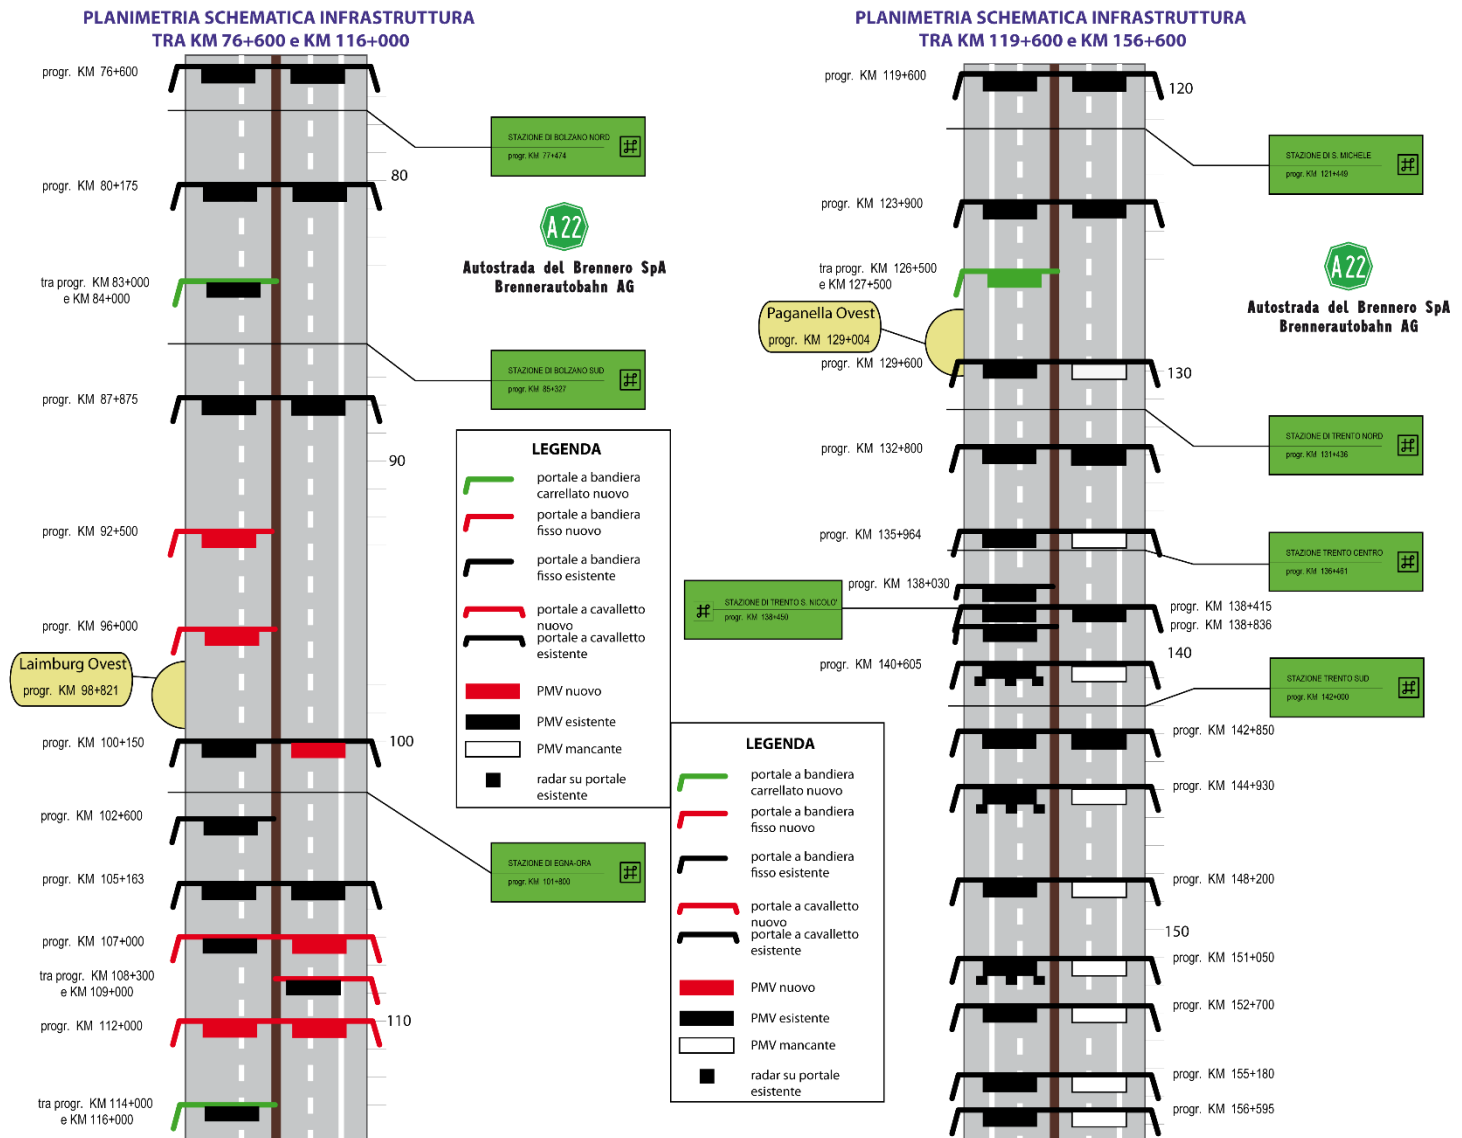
VMS infrastructure as in the original upgrade plan (in red and green the new proposed installations, with “portale a bandiera” and “portale a cavalletto” meaning meaning “flag VMS” and “gantry VMS”, respectively).
